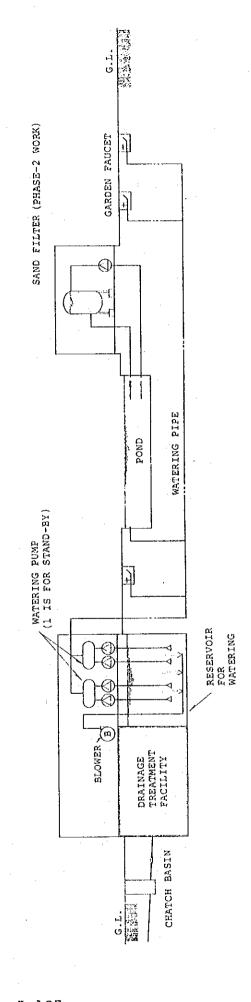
SCHEMATIC PIPING DIAGRAM OF WATERING SYSTEM
